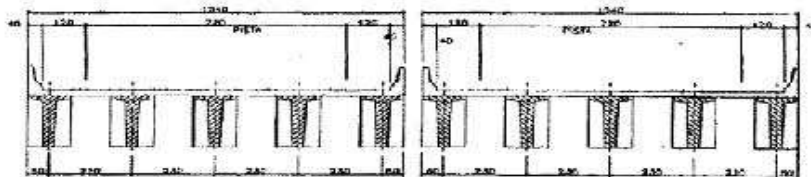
Typical sections for bridges with lengths of more than 60 m
